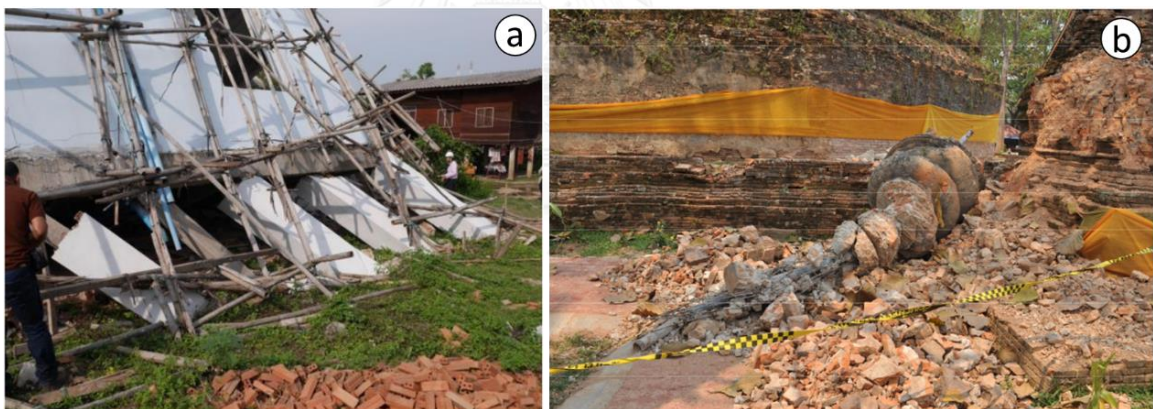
1. a) The damage of reinforced concrete structure (Soralump et al.,2014).
